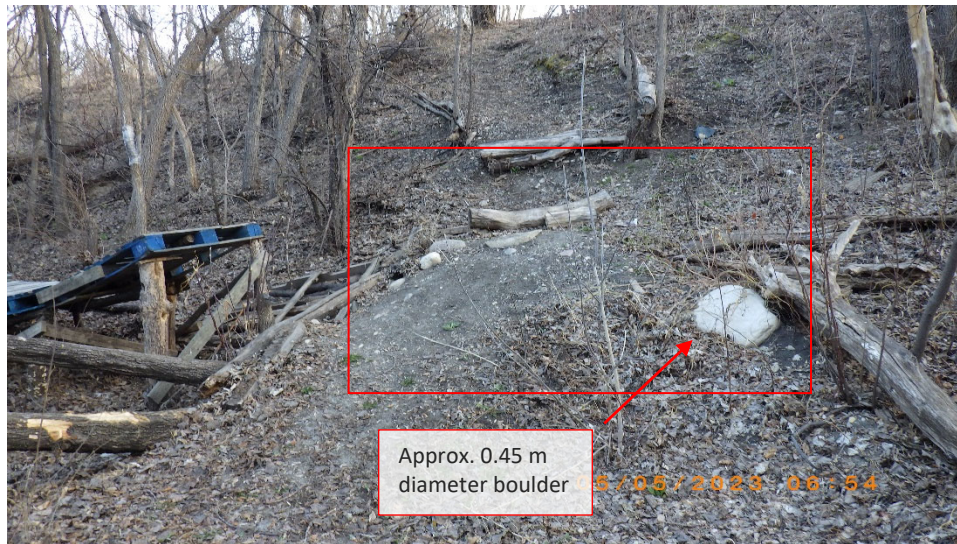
BOULDERS OBSERVED WEST OF PROPOSED PIPE ALIGNMENT
